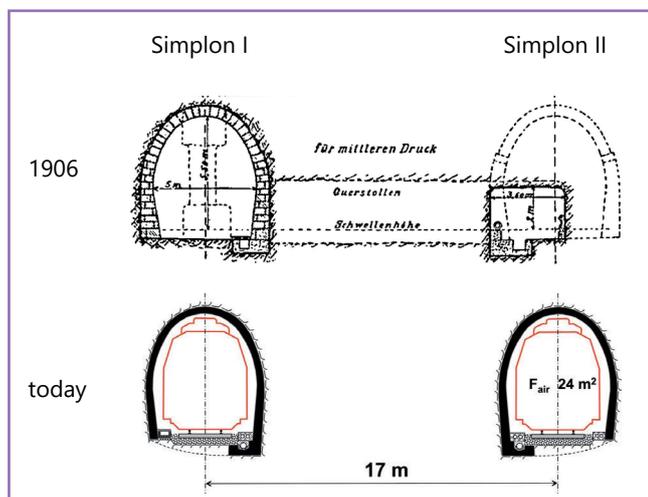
Transverse profile of the Simplon Tunnel when it was commissioned with only the side tunnel (1906) and as a fully-built twin-tube system from 1922 onwards
